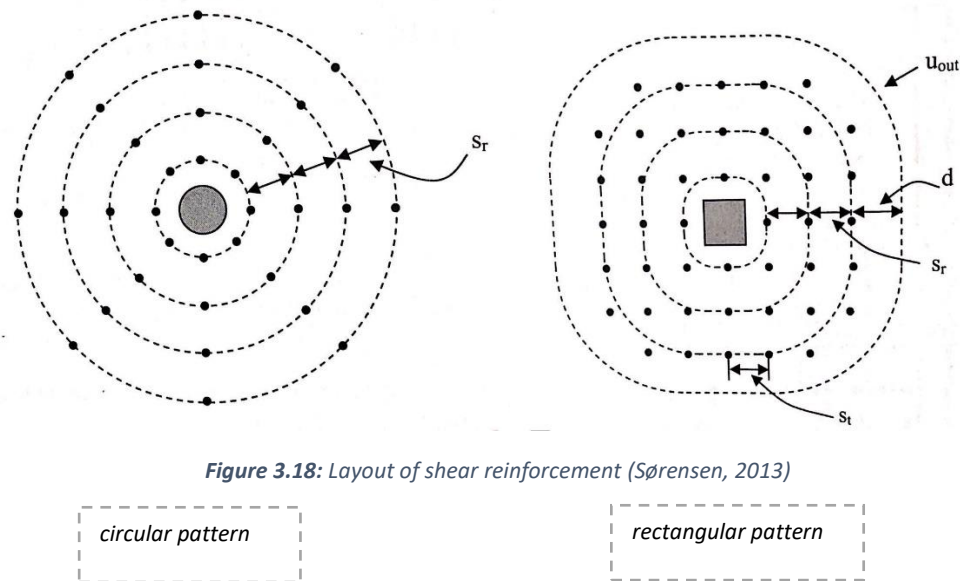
Layout of shear reinforcement (Sørensen, 2013)
